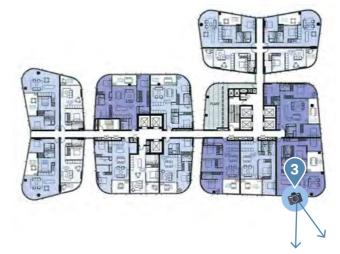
DOCUMENTED VIEWS LOCATION MAP AND ELEVATION
